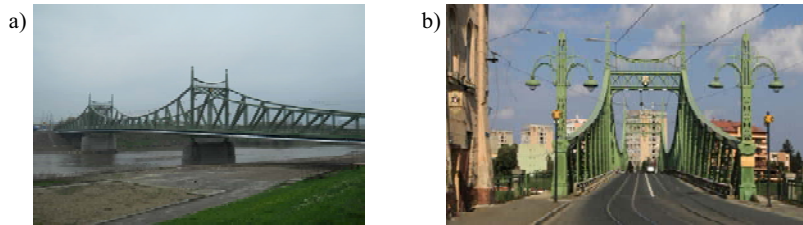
Traian Bridge: (a) general view; (b) section view.
